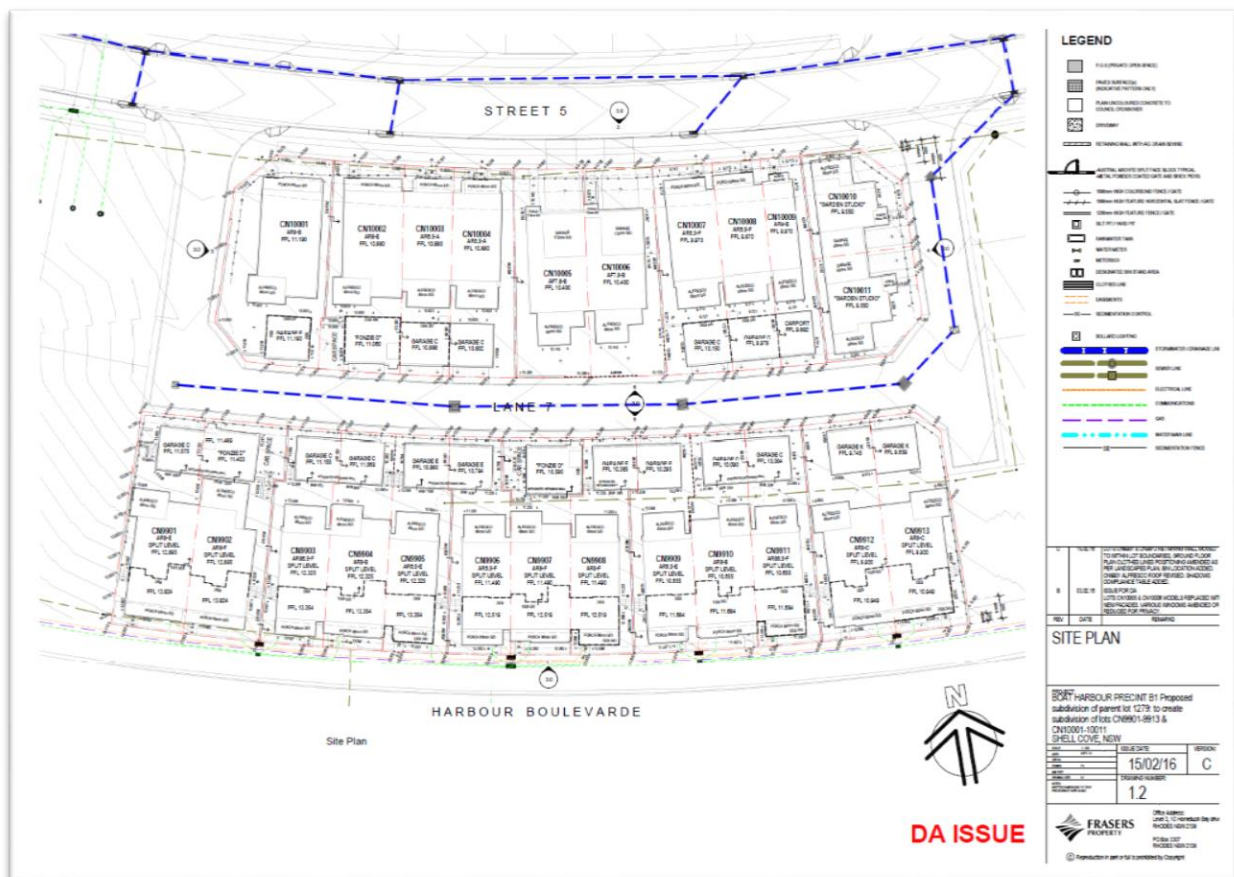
Indicative Layout (unregistered Lot 99-100)
